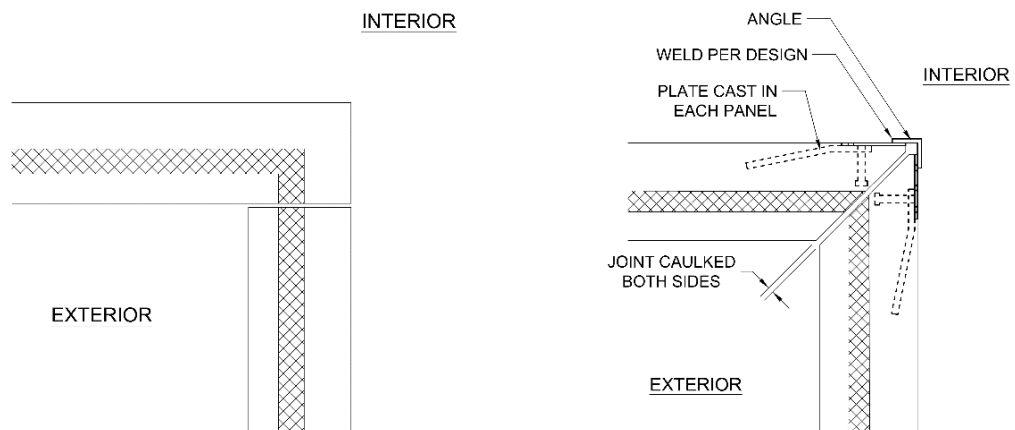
Sample reentrant corner details with minimal thermal bridging
